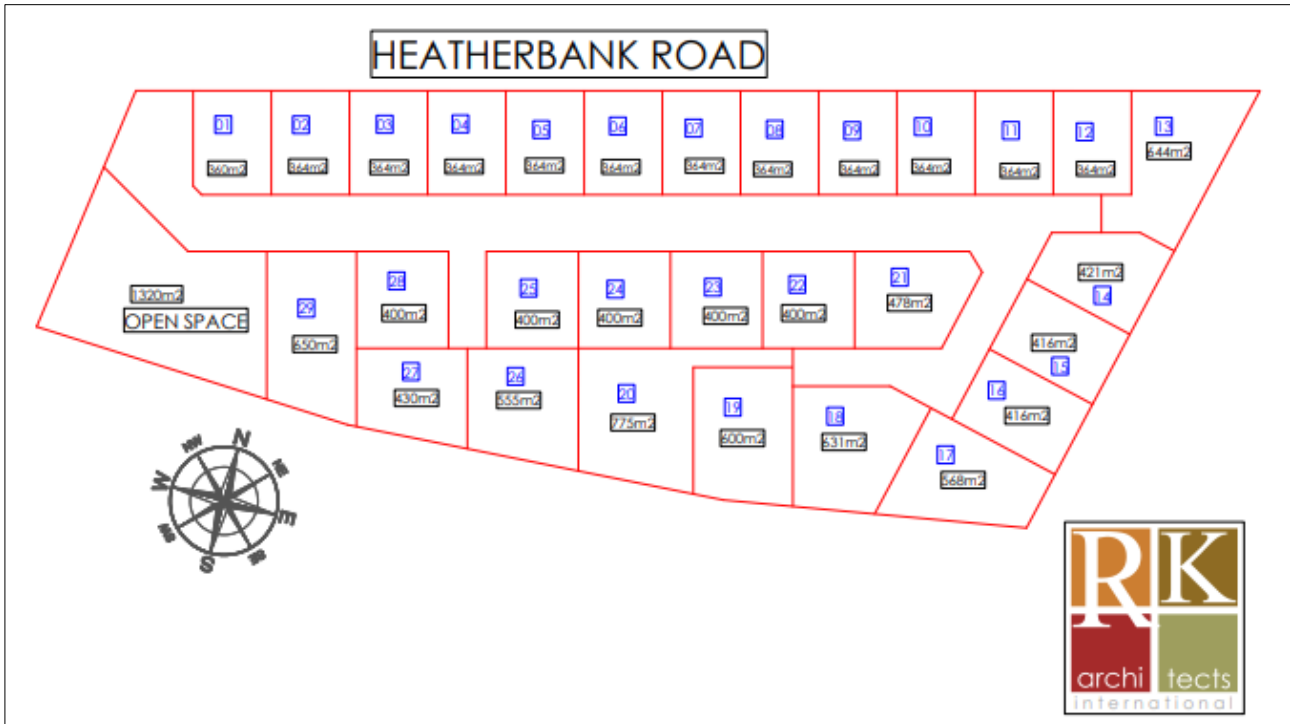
Layout of the proposed new “The Heath” housing development along Heatherbank road.
